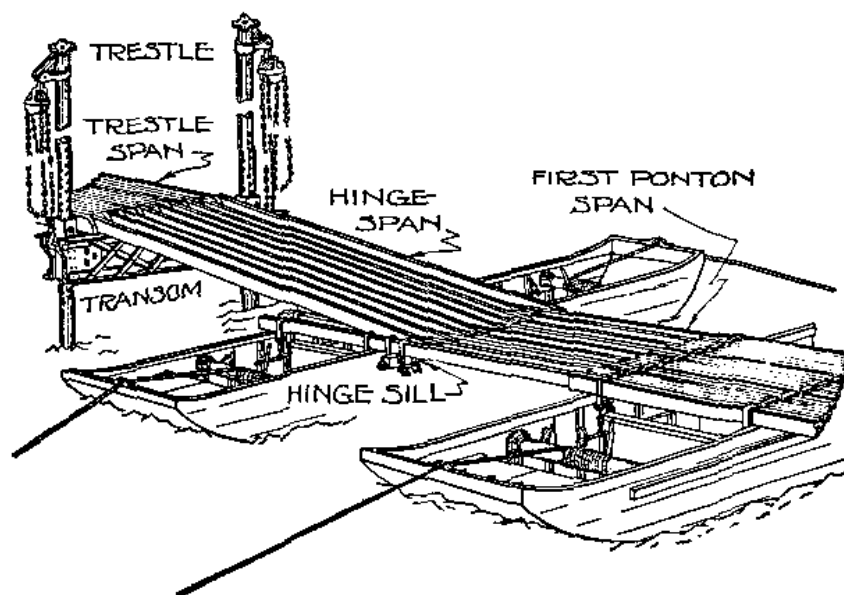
Hinge sill raft and trestle (23-ton model 1924 bridge).
